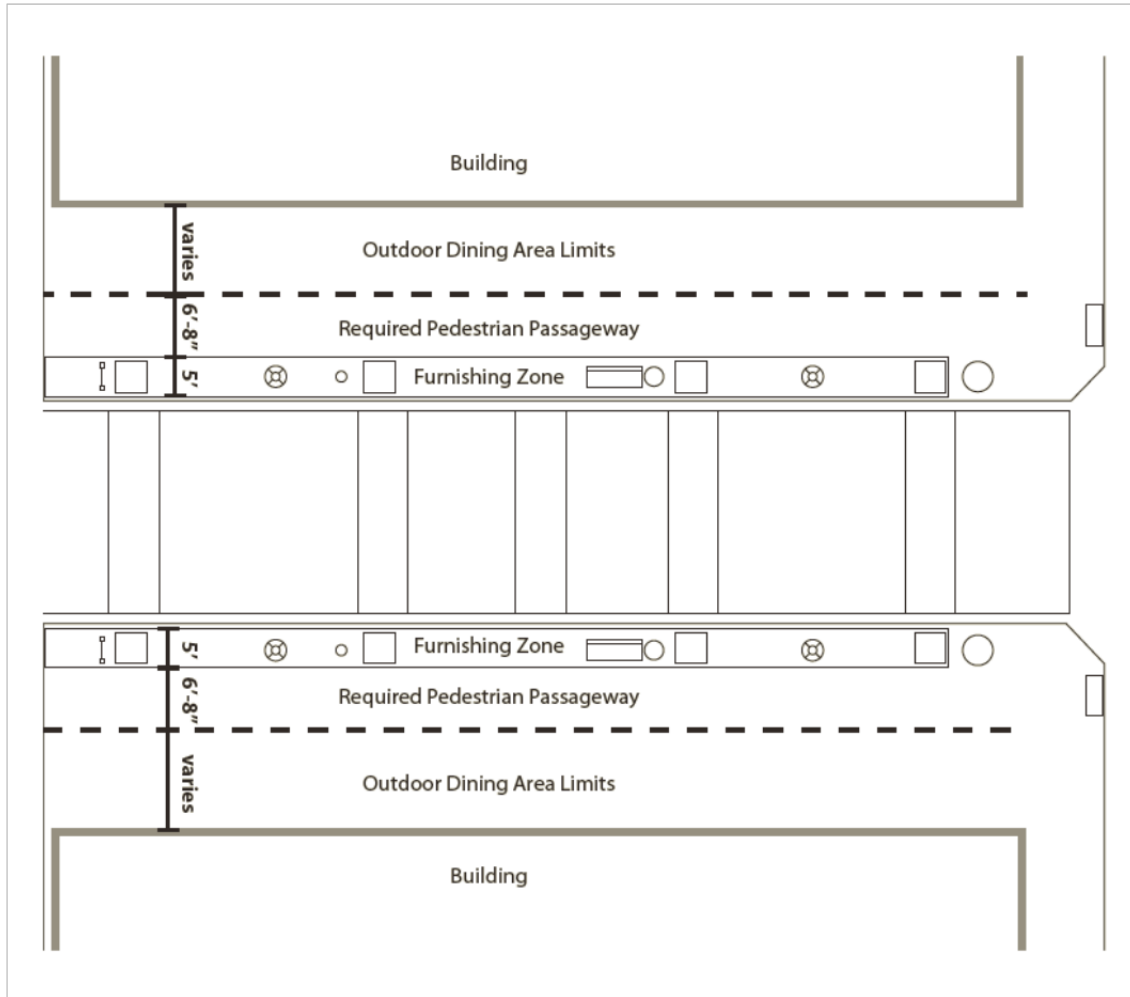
Location of Furnishing Zone, Required Pedestrian Passageway and Outdoor Dining Area Limits on 8th Street between Bannock and Main streets.
